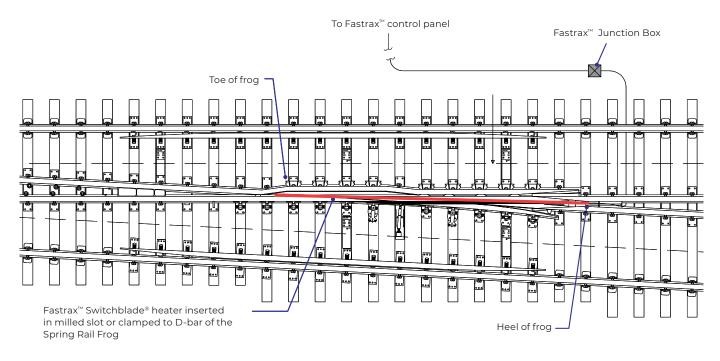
Typical Spring Rail Frog Heating Layout - Equipment Detail, All Standard Sizes (All Tie Styles)
